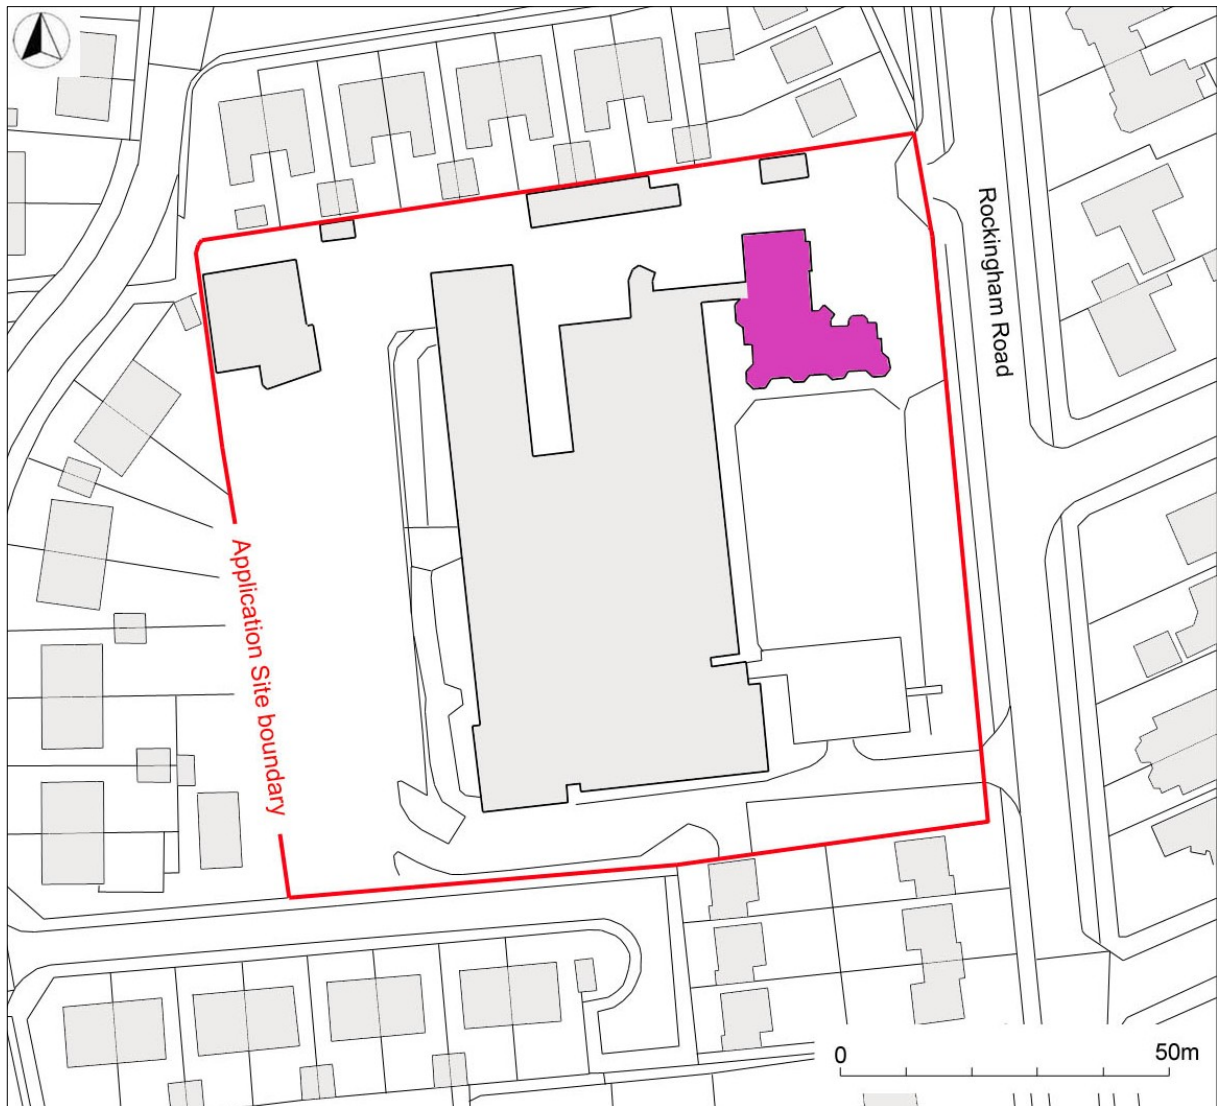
The Application Site: layout of existing buildings and location of Avenue House (purple)
